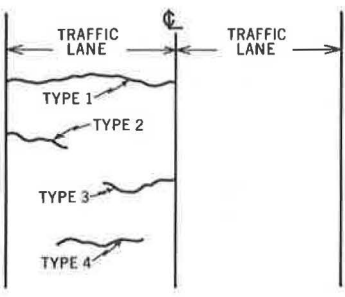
Transverse cracking (4-year old pavement made with 85- to 100-penetration asphalt).
